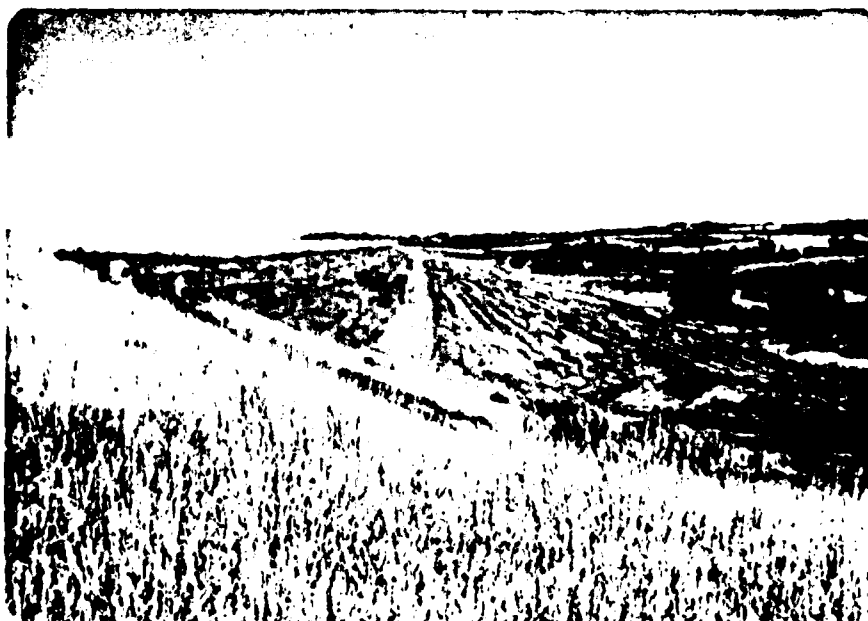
View of downstream slope of the dam from the right abutment. September 1982
